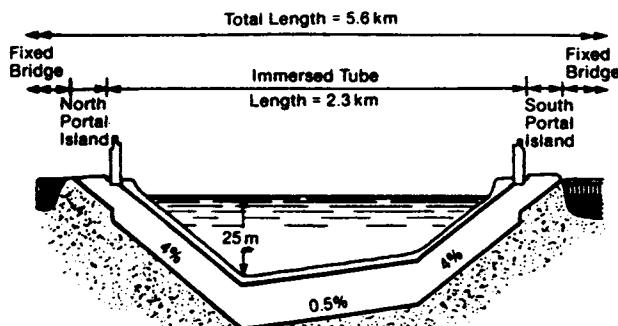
Hampton Roads Bridge-Tunnel.
